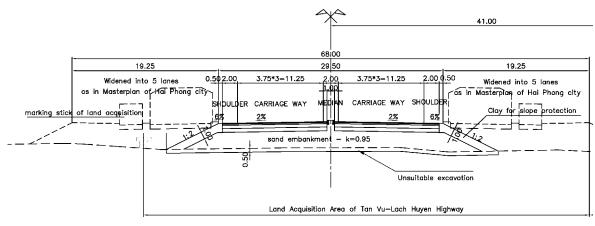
and 2.2.3 show the typical cross sections for the first stage and second stage, respectively. Details for the application of the stage construction are described in Section 2.4.3.
